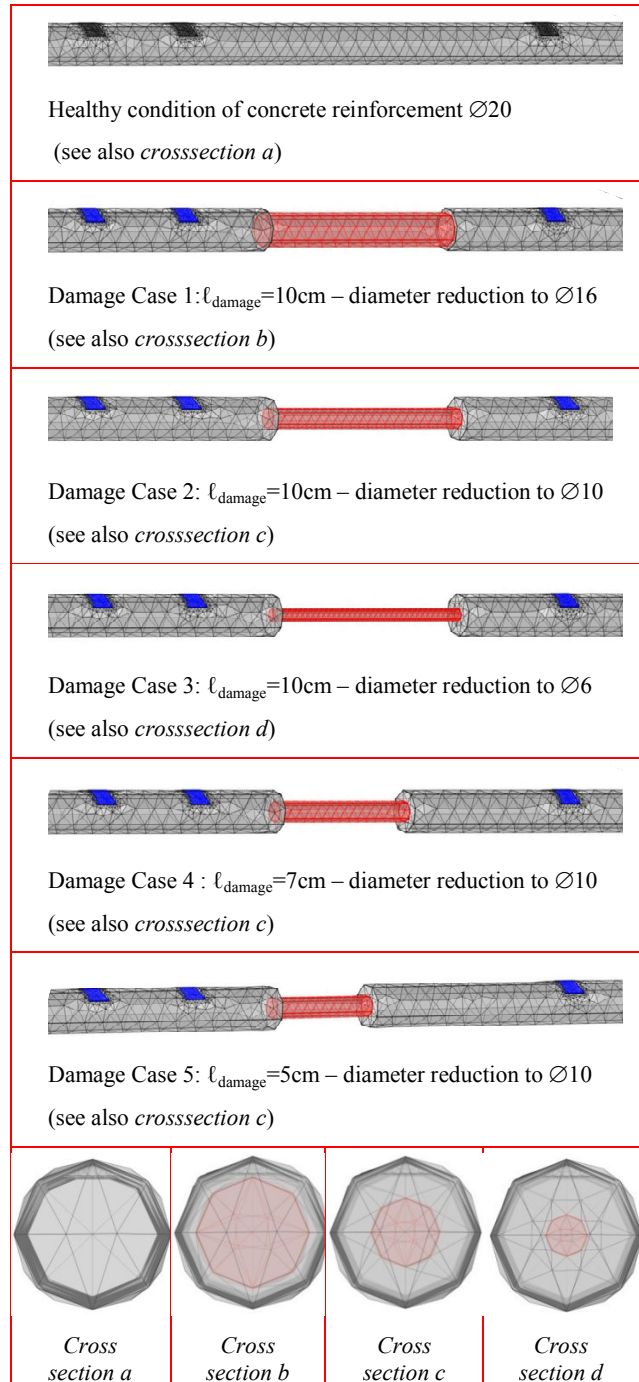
Damage cases and mesh of the 3-D model of the concrete reinforcement.
